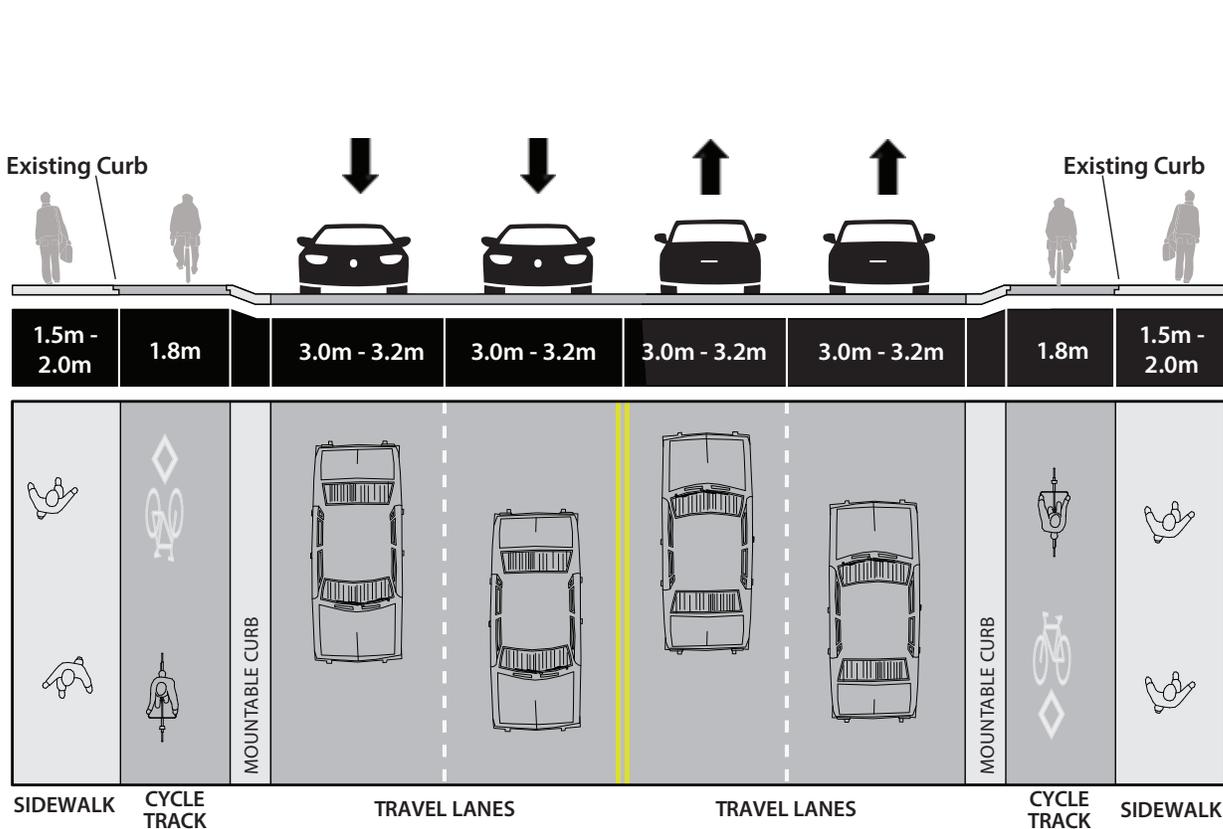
| Conceptual Shelbourne Street cross section, Pear Street to Christmas Avenue
